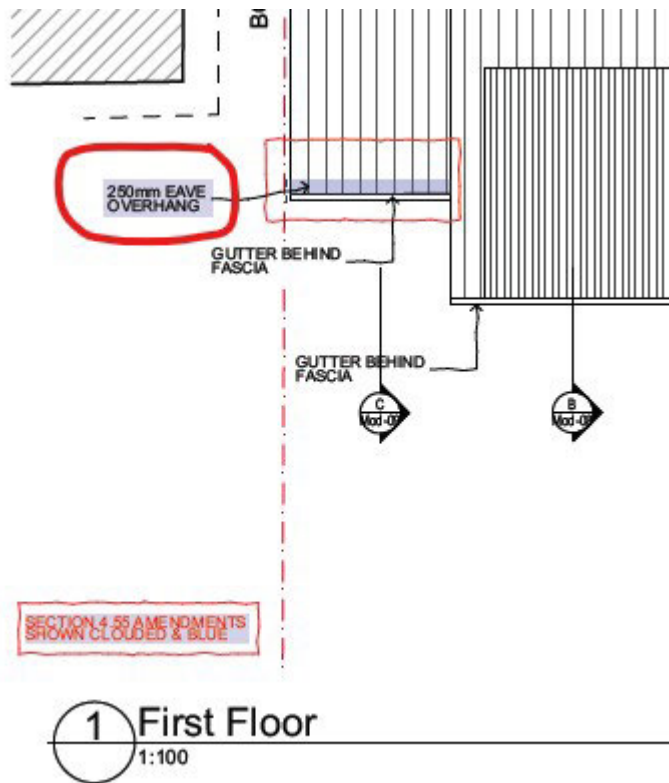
The Modification Application shows a 250mm eave overhang on the first floor.
